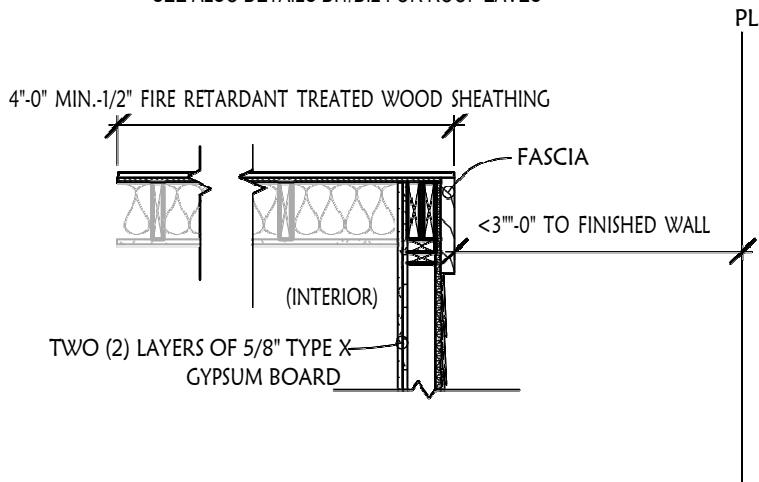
ROOF SHEATHING--EXISTING SHEATHING TO BE REPLACED
